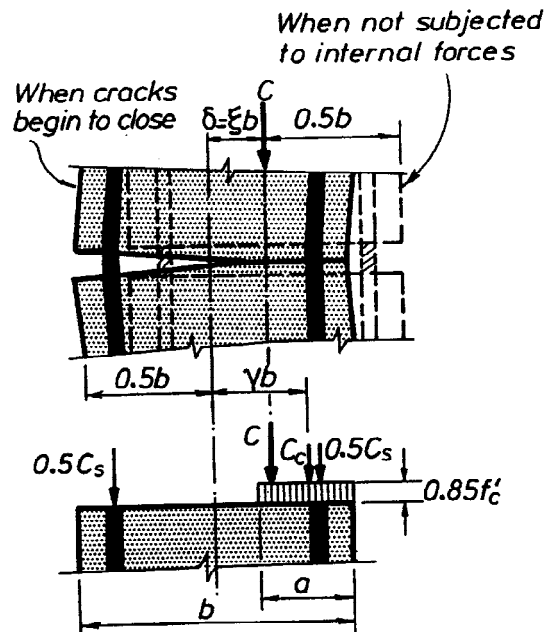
The relation in a wall section of internal forces to eccentricity.
